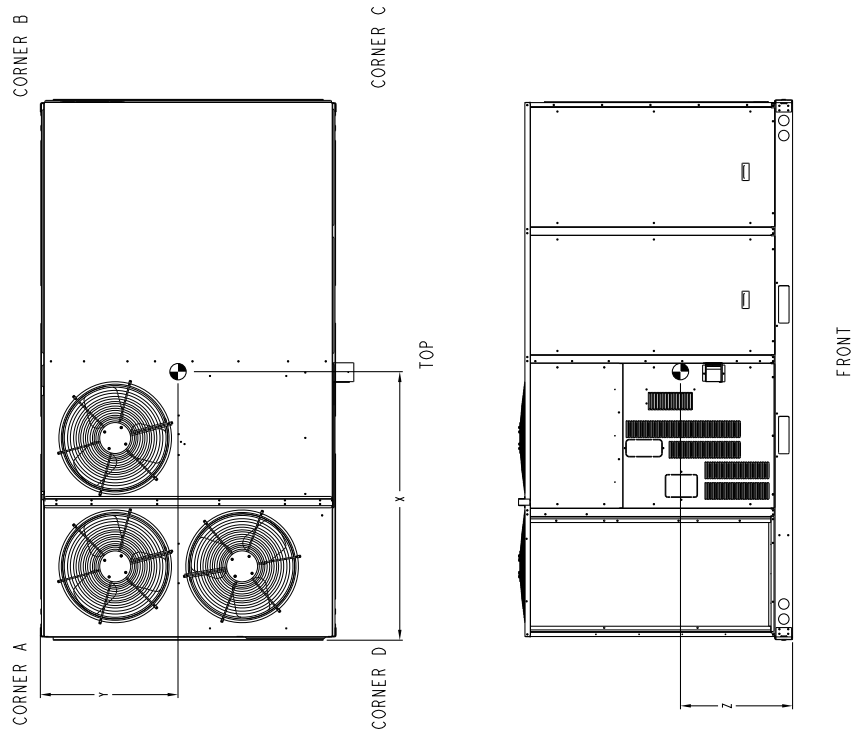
Unit Dimensional Drawing – 150 Size Unit
